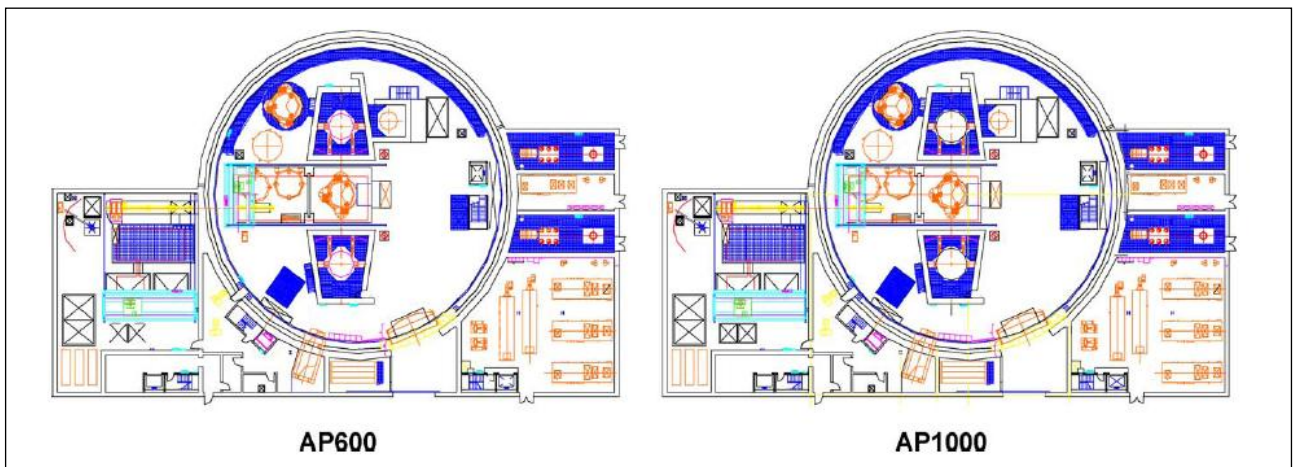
Westinghouse AP600 and AP1000 plants (plan)
